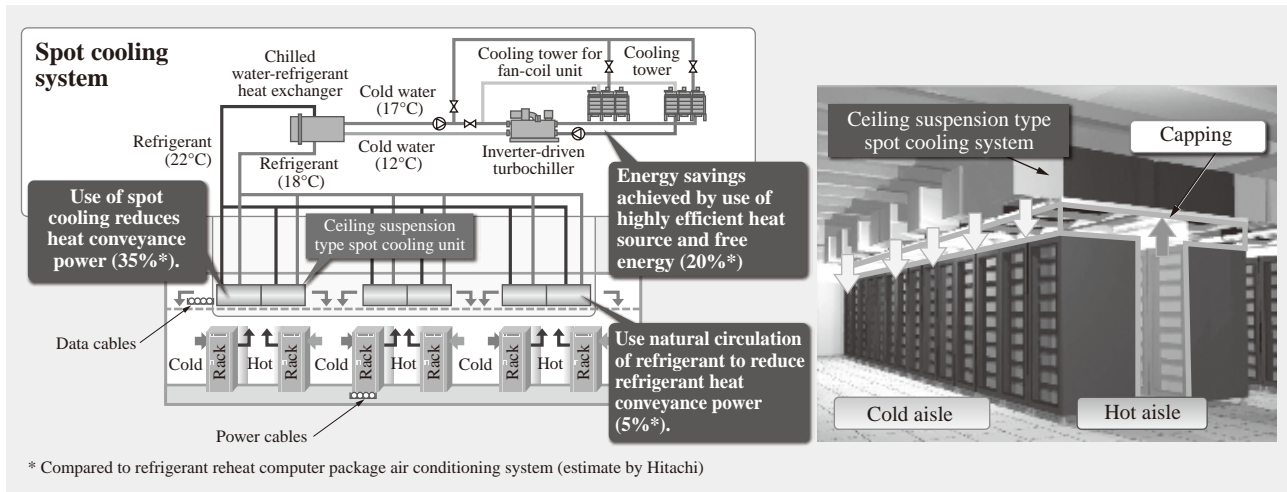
Overview of Spot Cooling System and Installation Layout.
